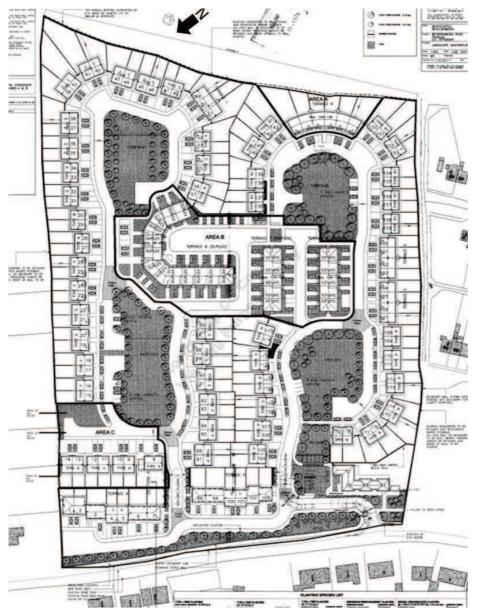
Permitted Site Layout Plan Reg. Ref. Extracted from Tipperary CoCo Planning Viewer
